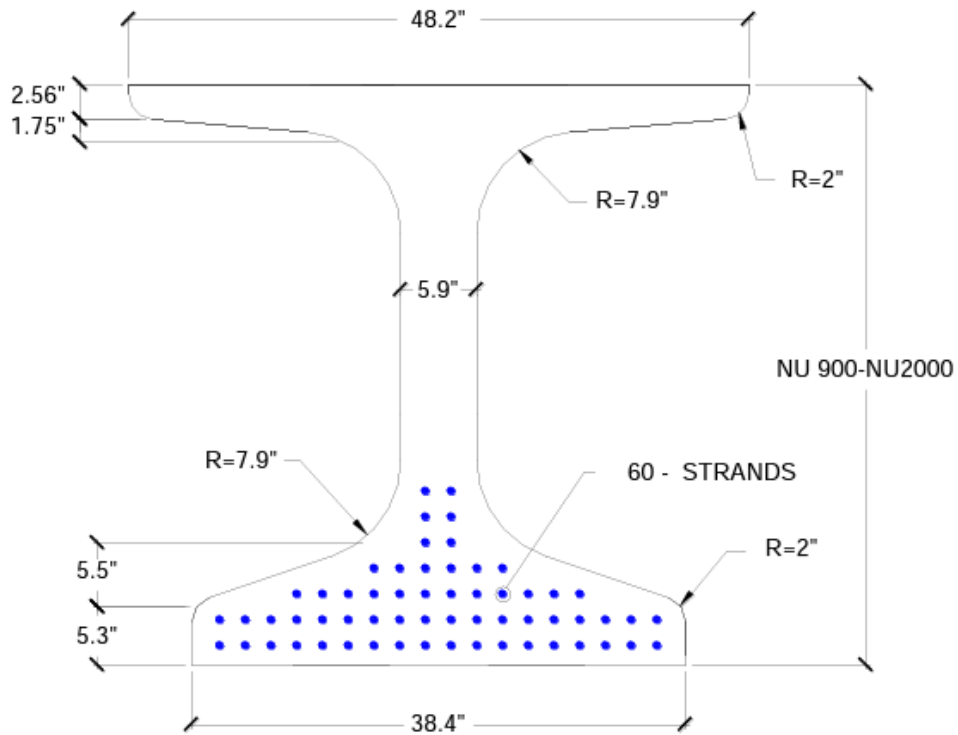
Pretensioned Nebraska University I-Girder with Strand Layout (Hanna et al., 2010)
